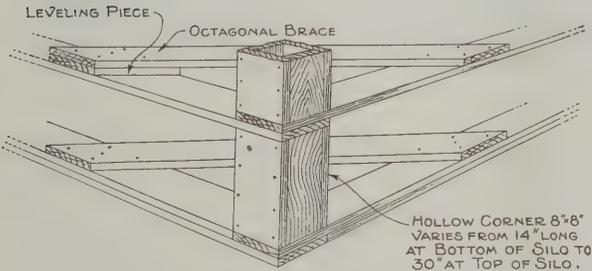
Detail Showing the Corner Construction with Its Octagonal Bracing
